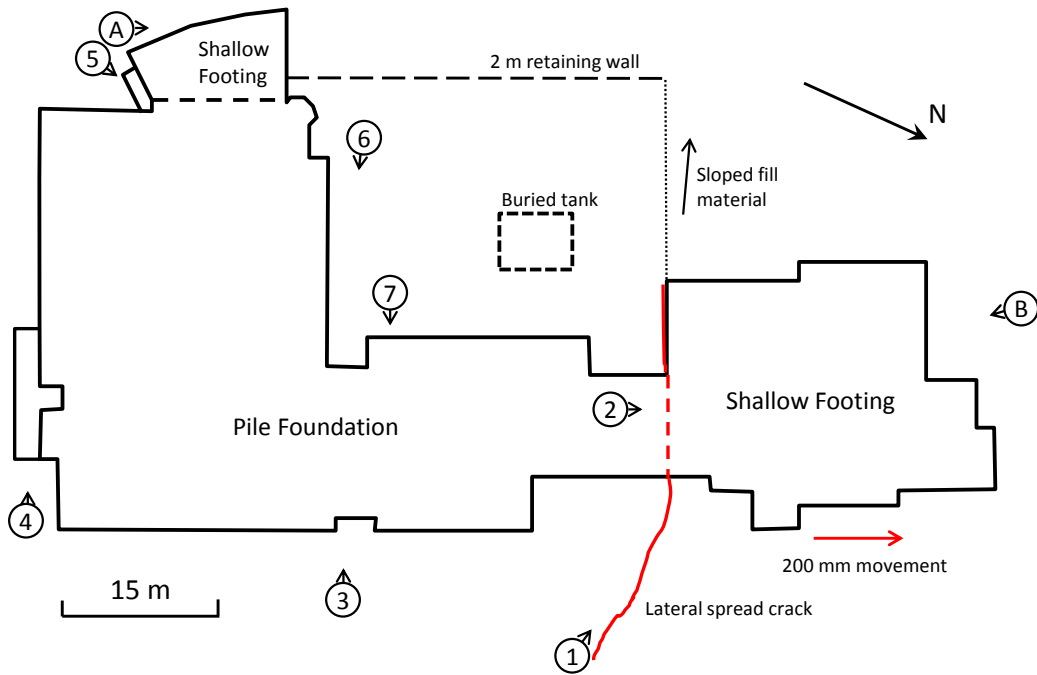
Layout of the Preparatory School indicating photo positions. (-43.508396°, 172.612766°)
